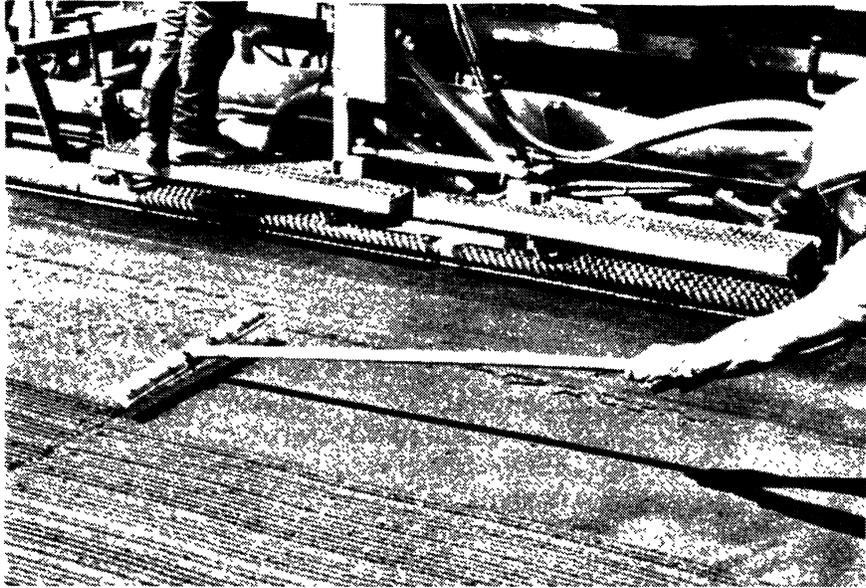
A tining device is used to place grooves in surface of conductive polymer concrete overlay.
